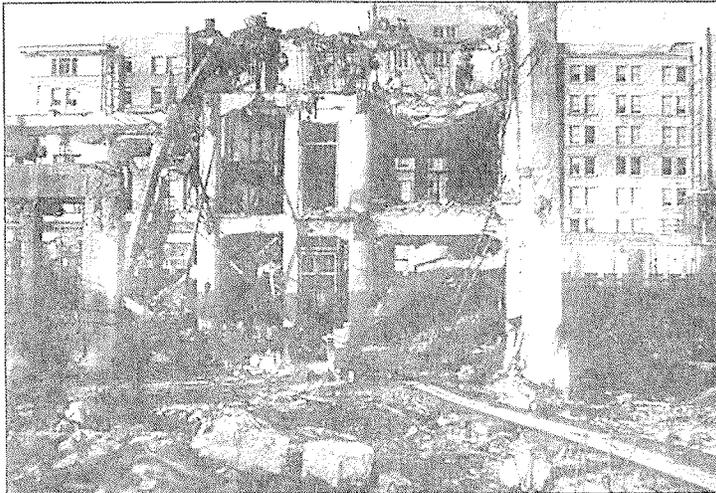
This 8-story reinforced concrete building was one of scores that collapsed during the 1923 Tokyo (Kanto) earthquake. The disaster prompted a limit on building heights. (Source: Carl V. Steinbrugge Collection, Earthquake Engineering Research Center)
